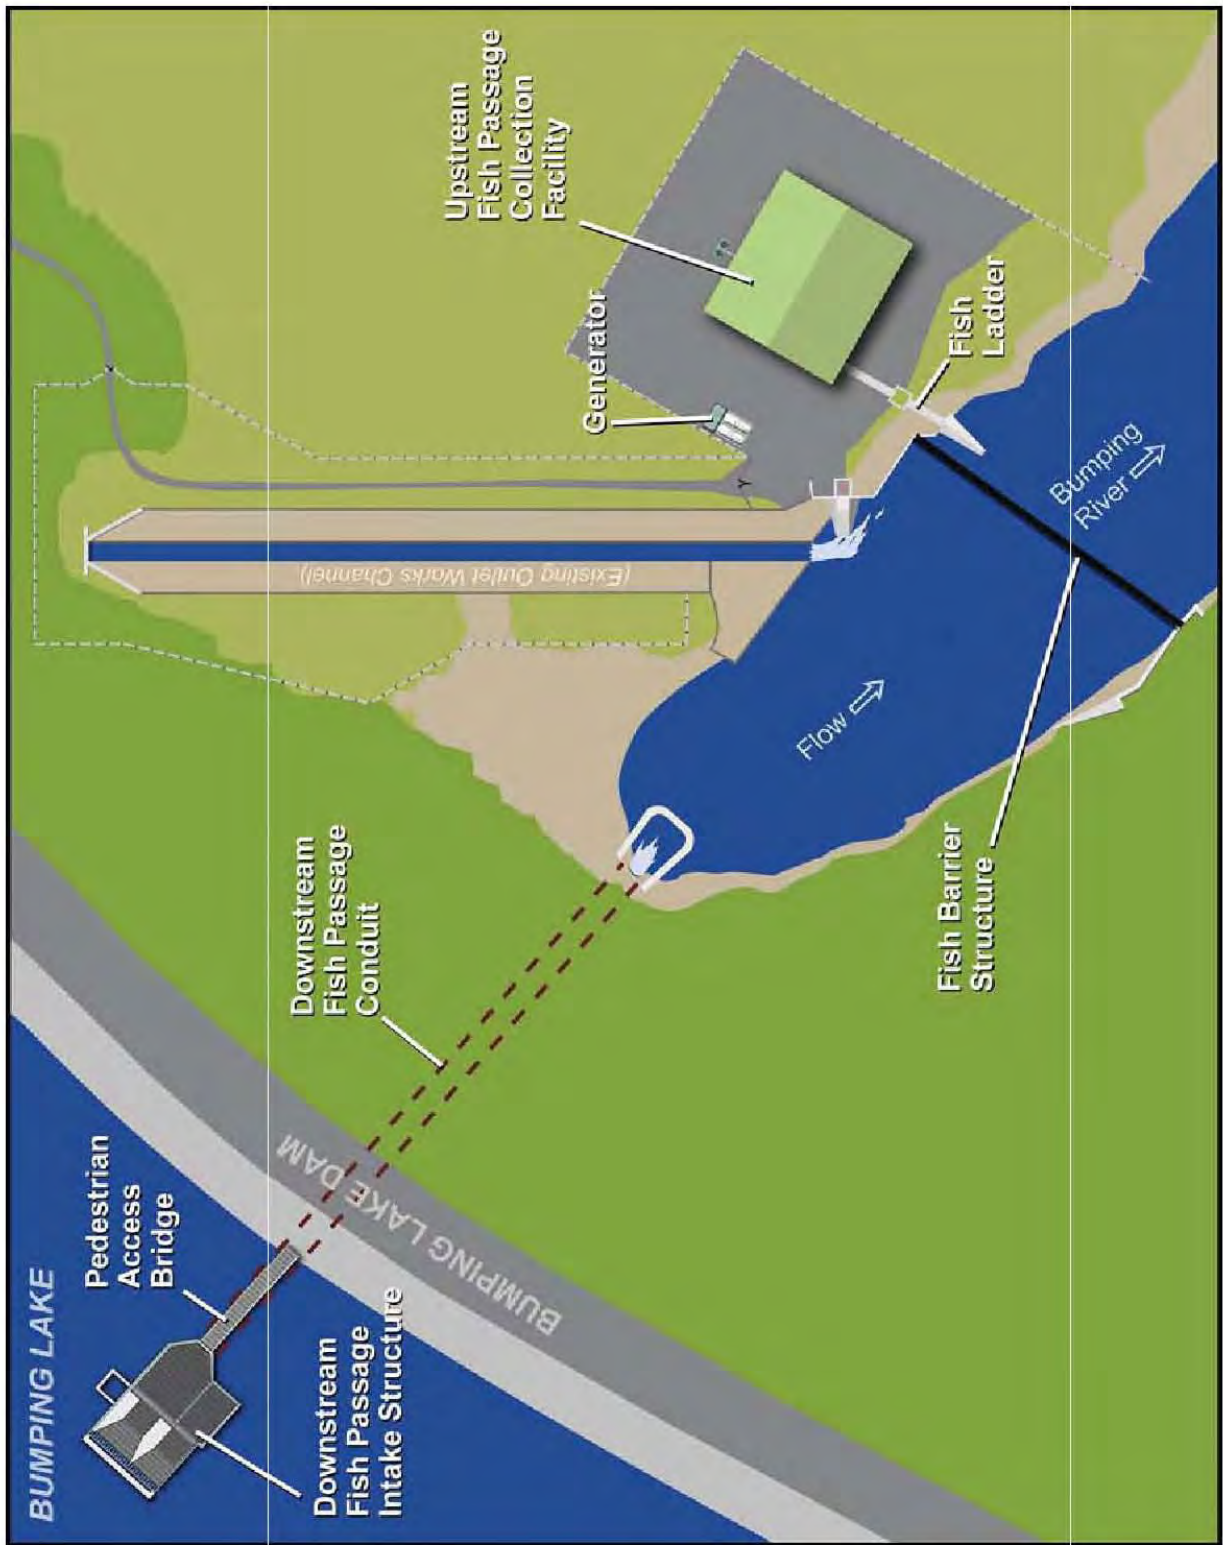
Bumping Lake Dam Upstream and Downstream Fish Passage Facilities.
